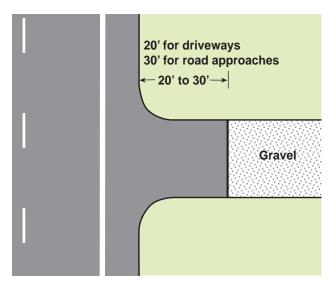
Gravel driveway paved to limit gravel on shoulders
